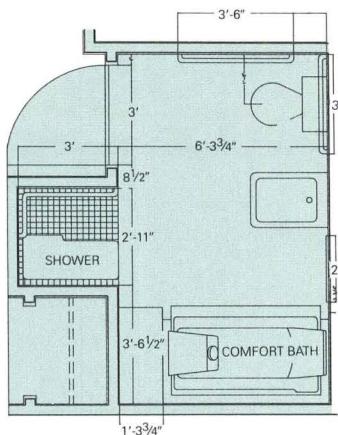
, BATHROOM PLAN, STANDARD BATHROOM WITH COMFORT BATHTUB
